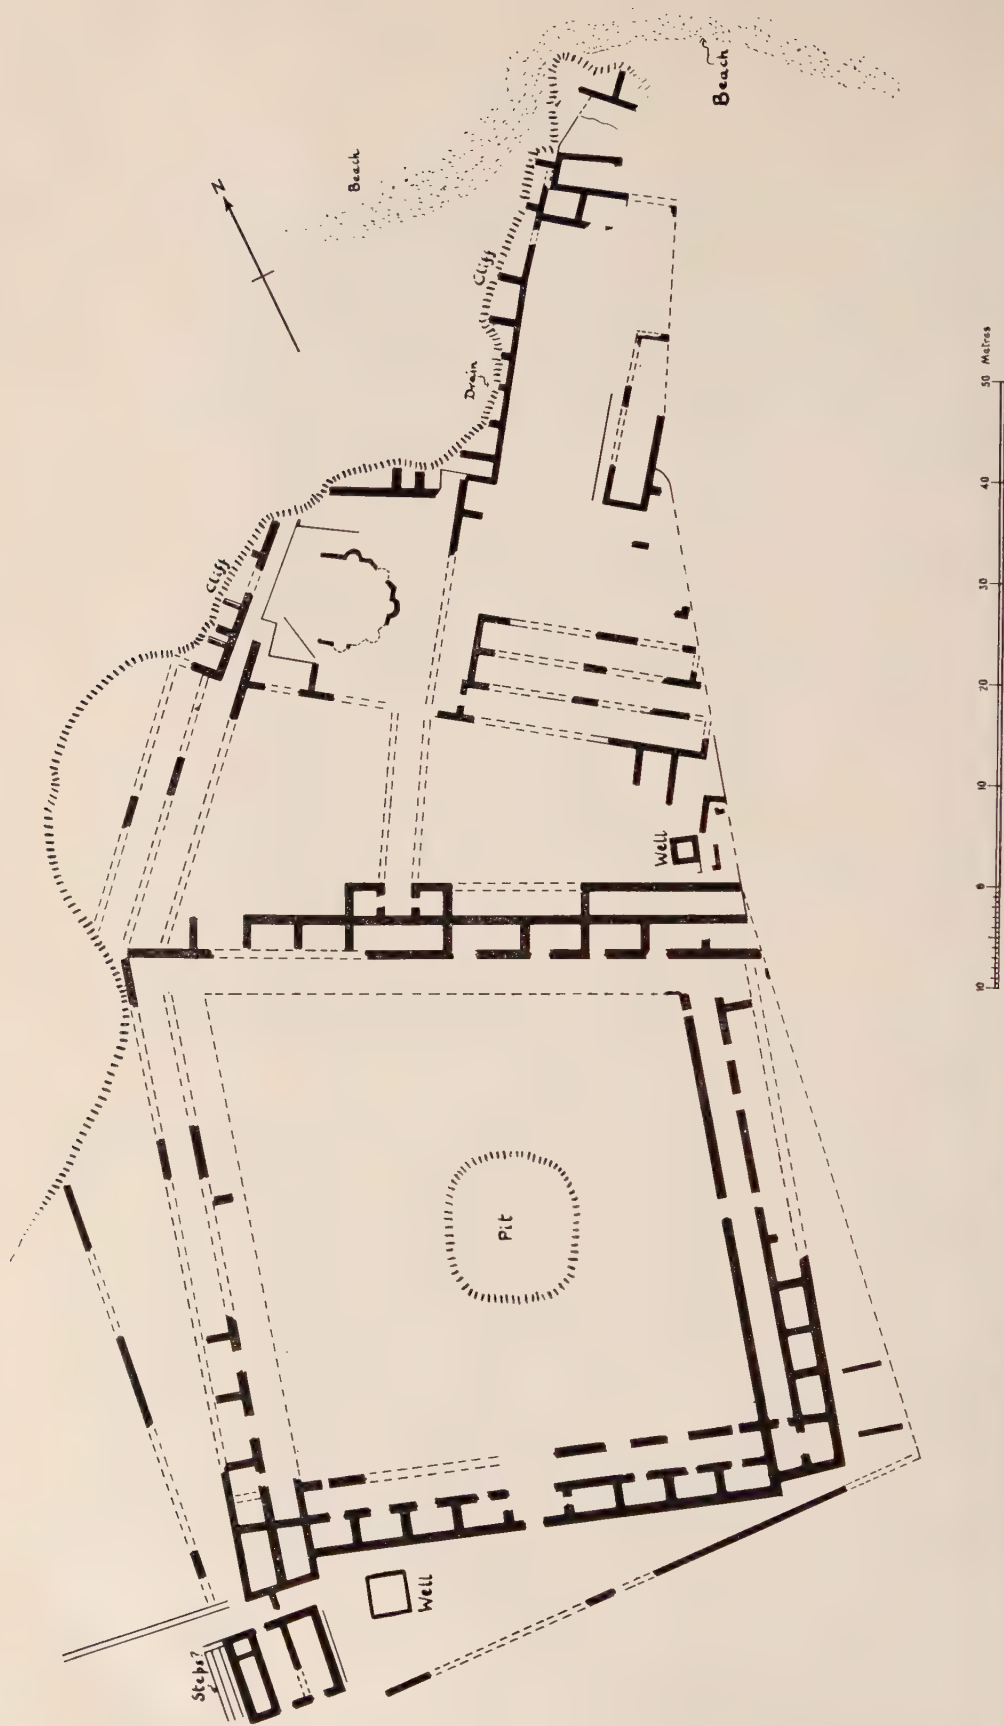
Plan of Husuni Kubwa. [N.B.—The single dotted lines represent somewhat doubtful walls.]
